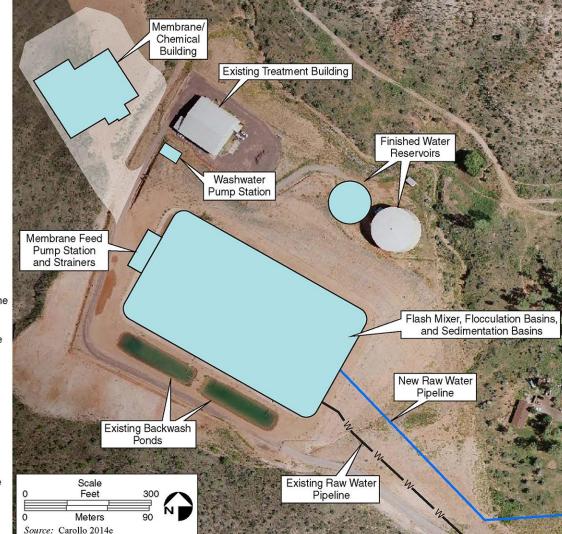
Proposed Water Treatment Plant Expansion
